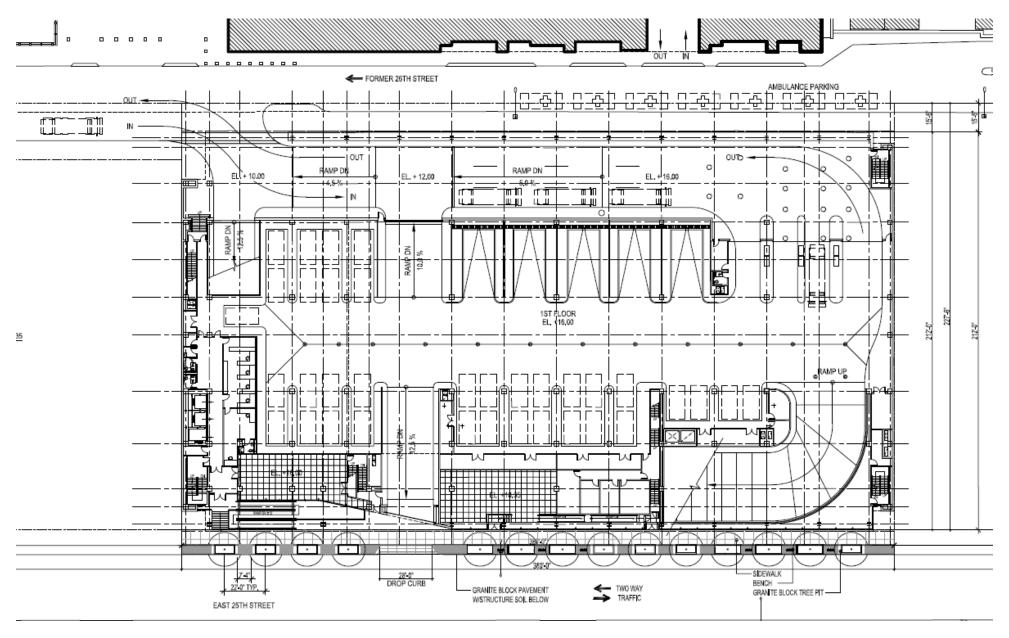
DSNY Garage Complex: Site Plan and First Floor Plan
